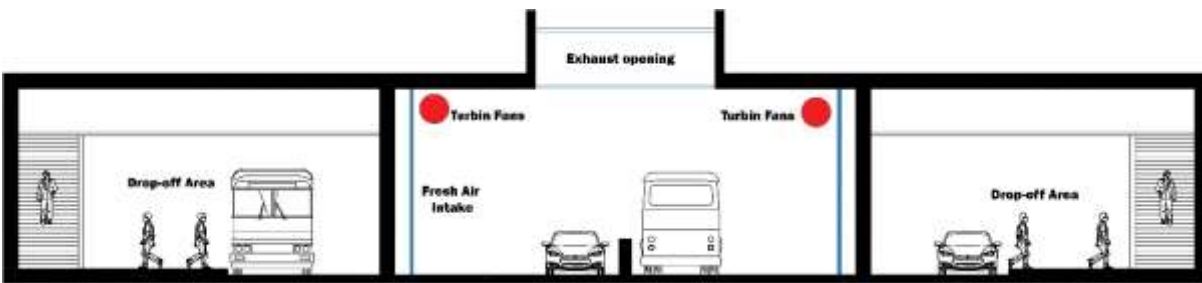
Cross section showing tunnel sub-areas and mechanical components.
